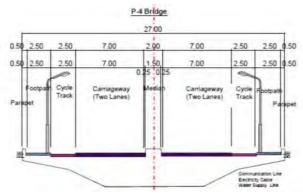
Proposed Typical Cross Section (Primary-4 Lanes)
